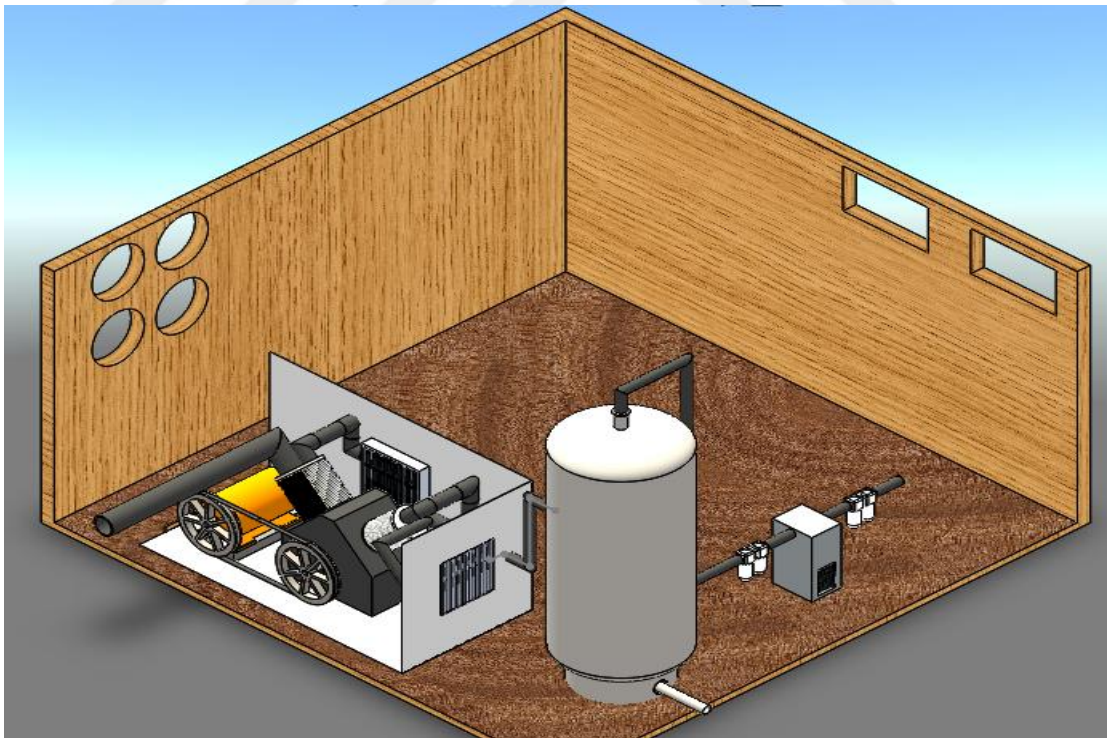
Compressor room installation should be user-friendly and expandable There should be 1200 mm area in front of machine electric cabinets at service points.
